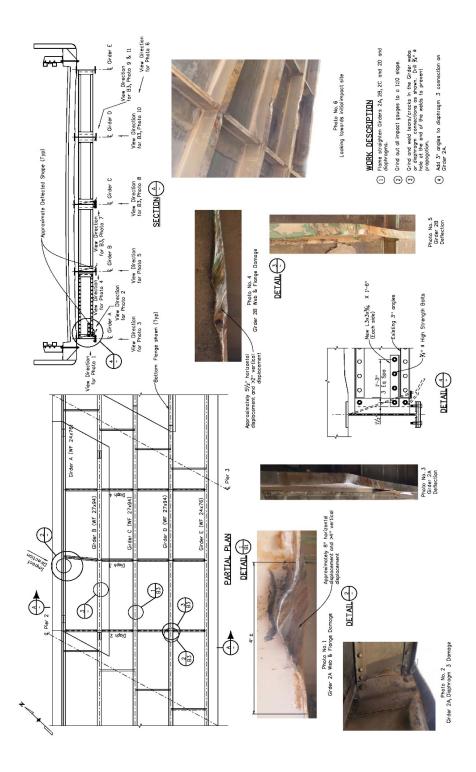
(E)-1 Sample of Plan for Steel Repairs
